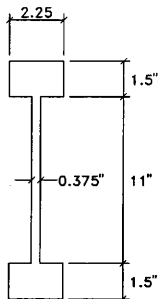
Cross sectional dimensions of a commercially produced wood I-beam.
